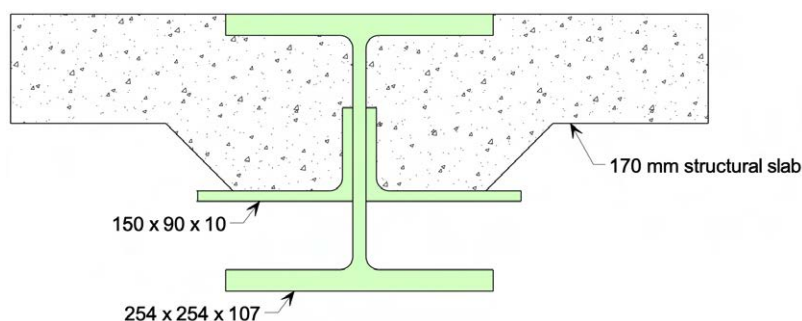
Cross-section through a 254 x 254 UC beam and 150 x 90 shelf angles supporting a composite slab with decking supplied with crushed ends
